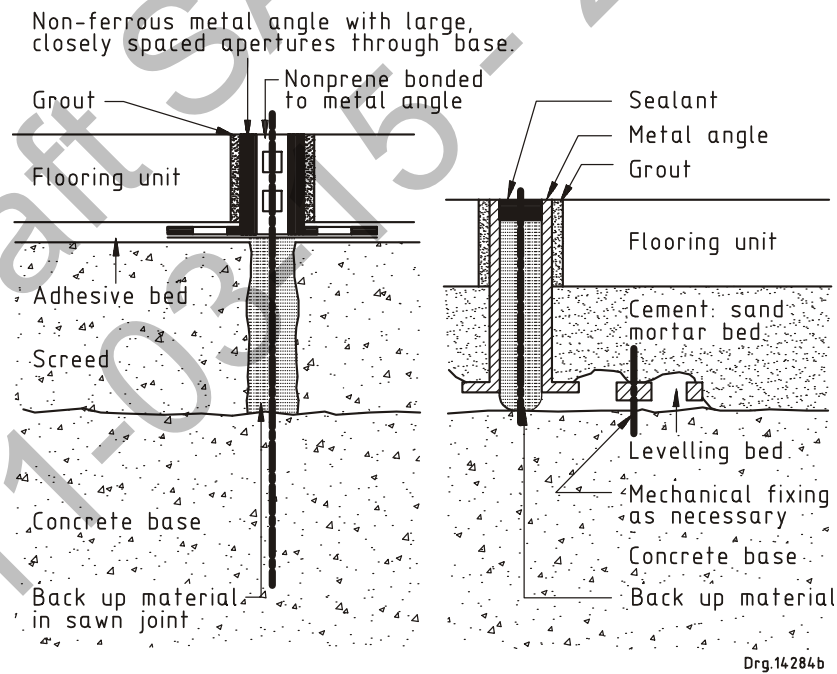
Type B: Prefabricated joint with reinforced edges and lapping over structural movement joint
